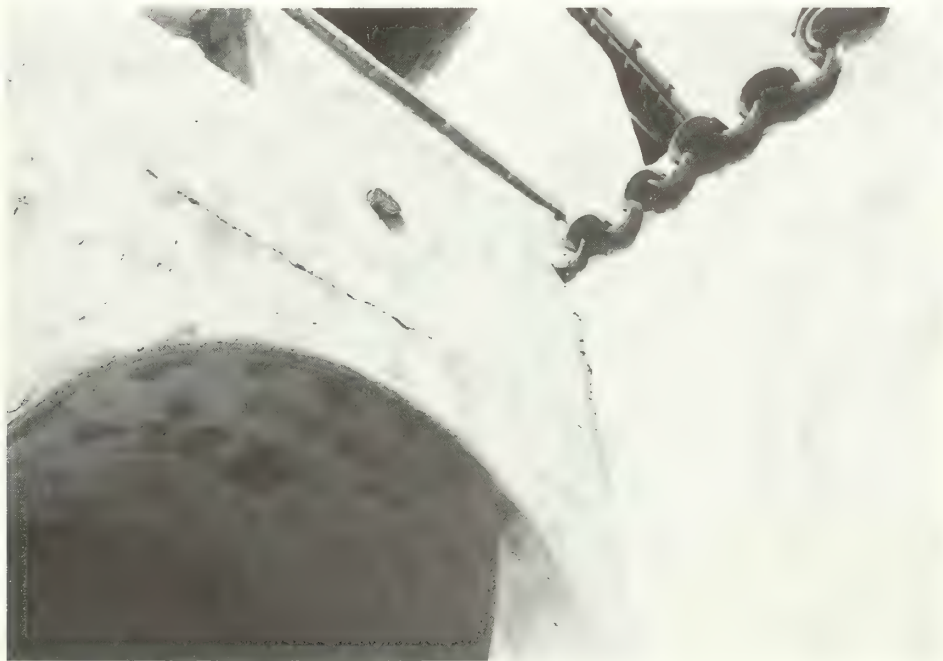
Southeast corner of Annex. Horizontal stucco crack above arch caused by joint in building framing. Vertical stucco crack in corner at junction with east Patio wall is predictable and a candidate for an expansion joint. (Photo by R. Silva)
